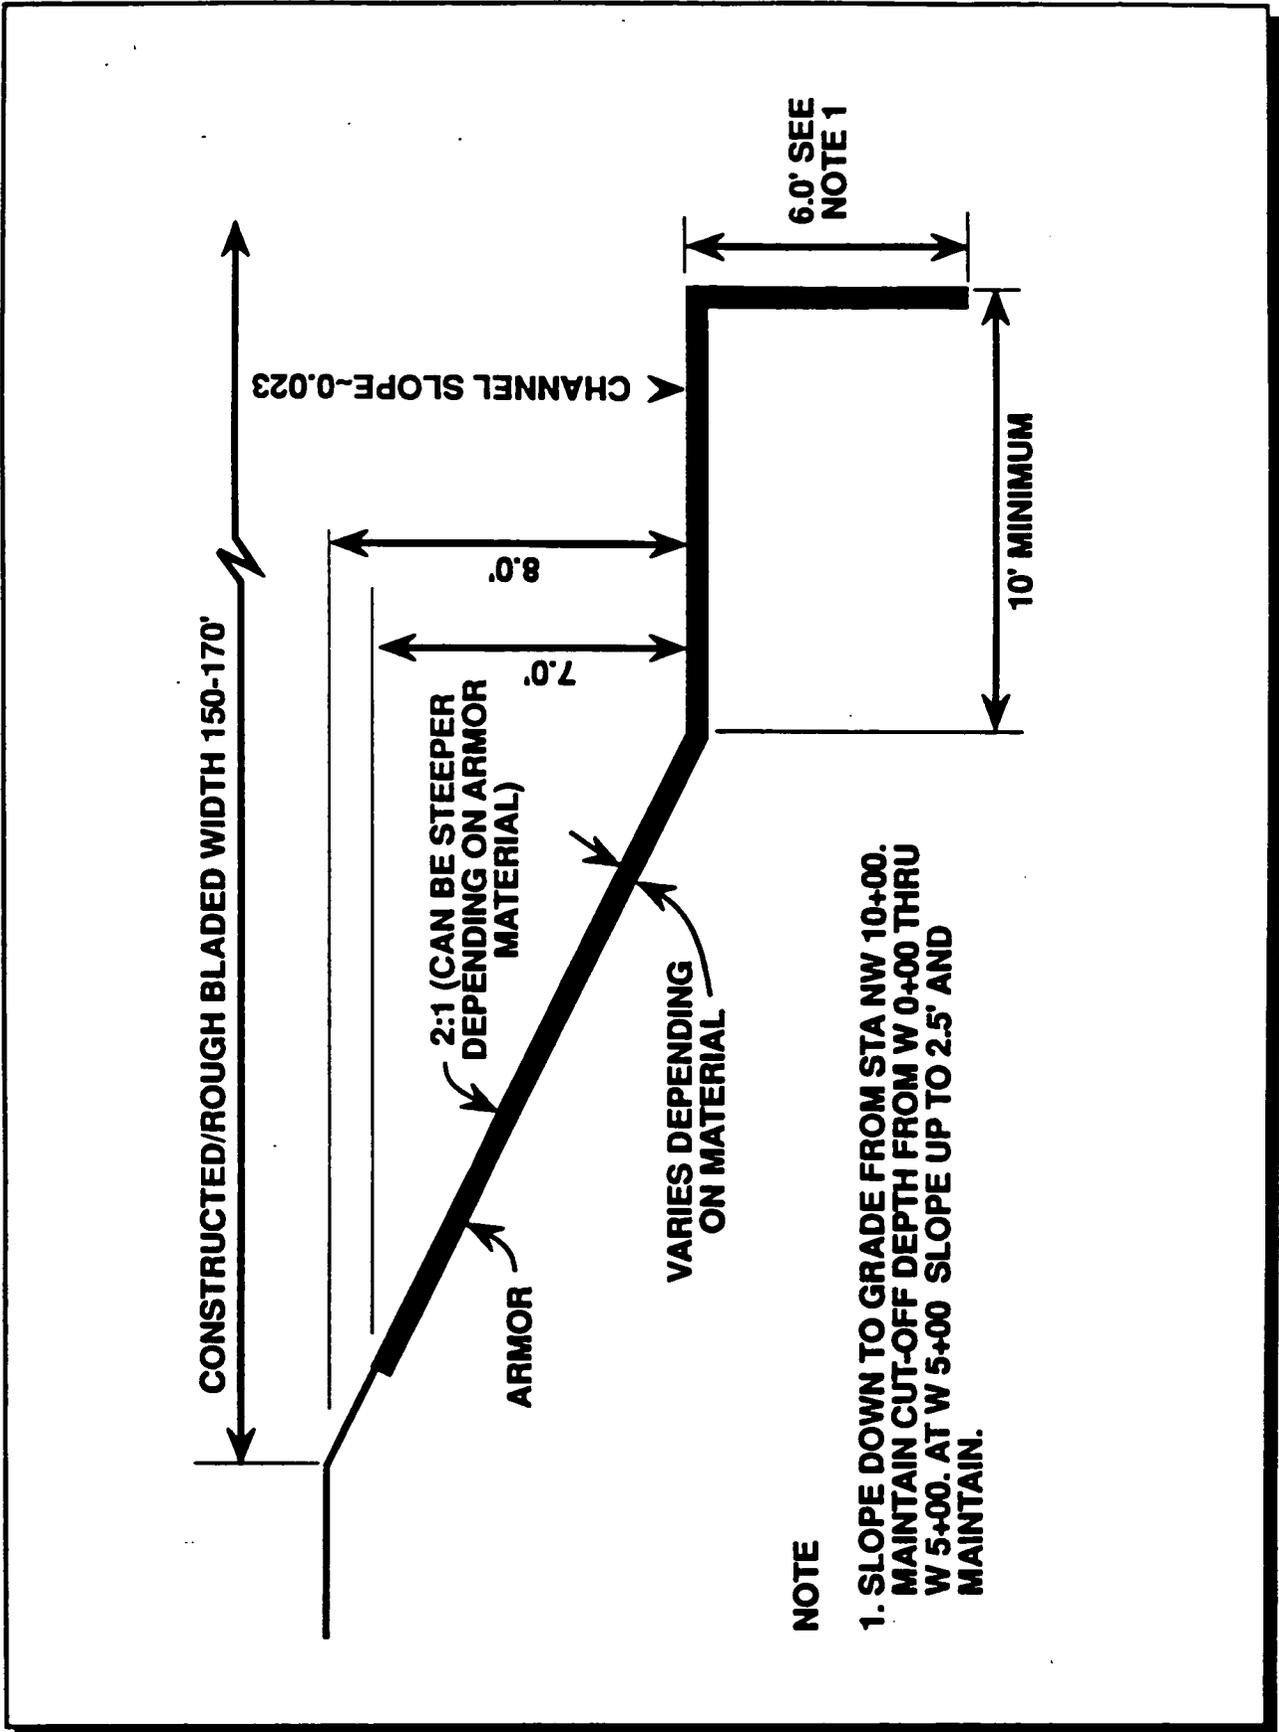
Typical Cross-Section for the West Flood Protection Dike and Storm Channel.
